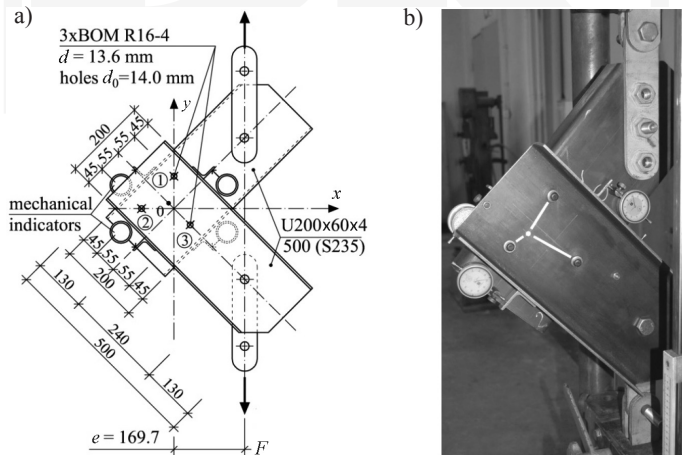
Eccentrically loaded test element „V” with 3-bolt joint: a) geometry of the element, b) element anchored in testing machine
